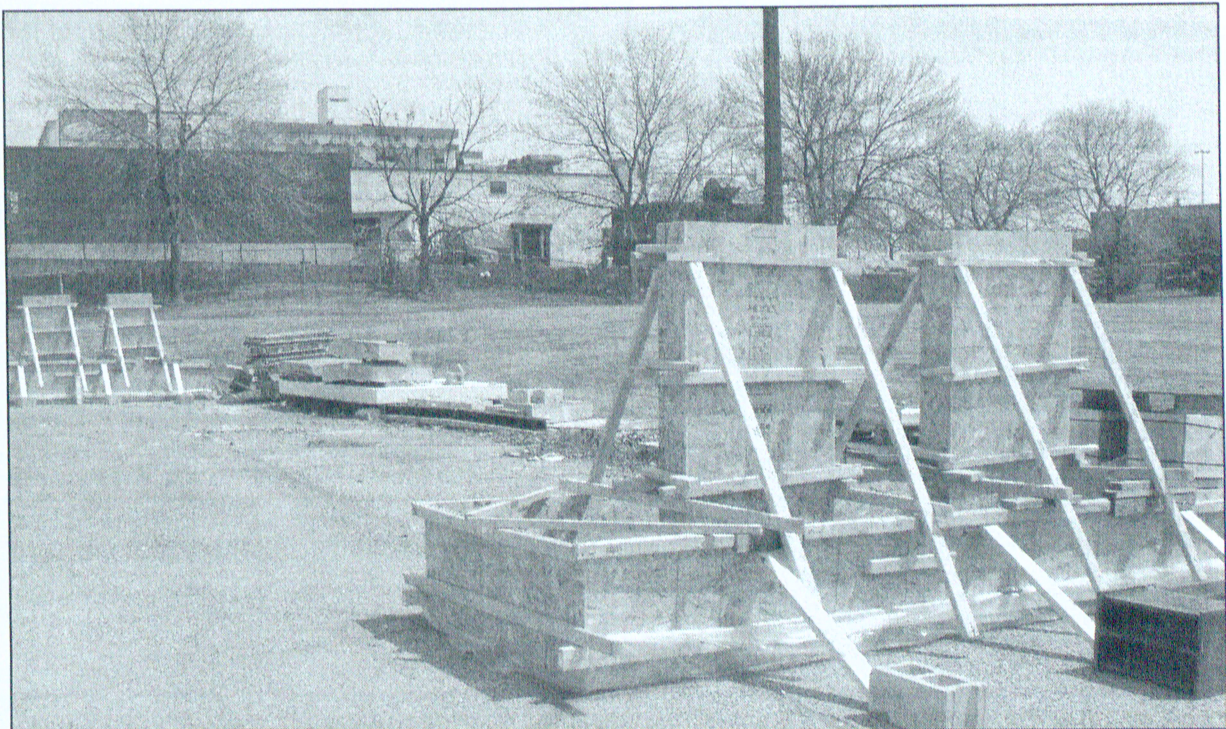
Formwork for the east (background) and west (foreground) foundations and support walls
